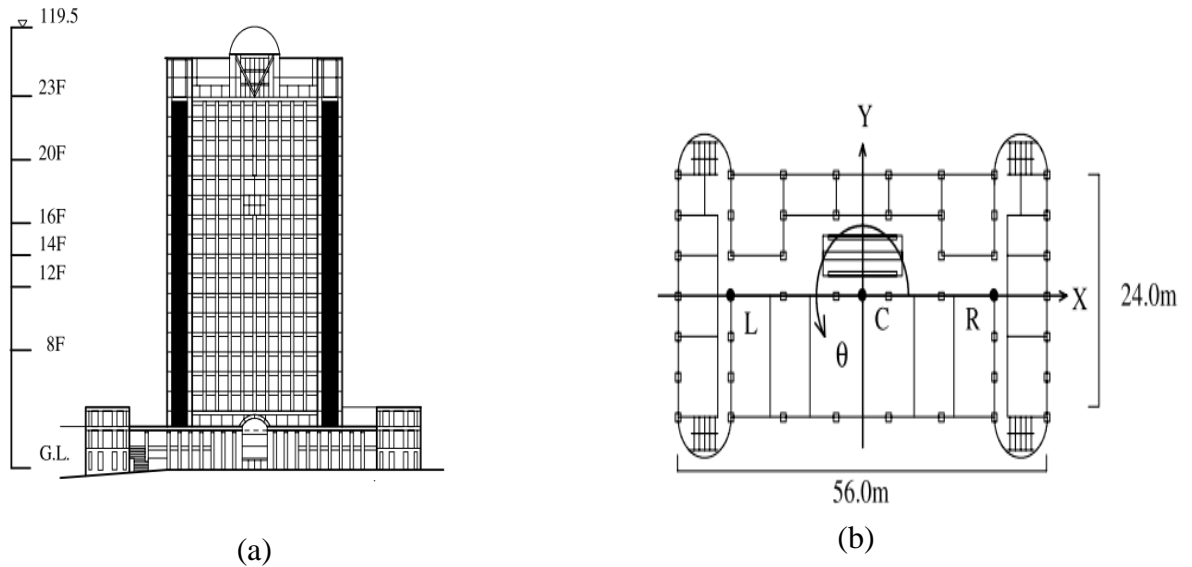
(a) Sensor locations in the Elevation of the building (b) Locations of the sensors in plan view (L, C, R)
